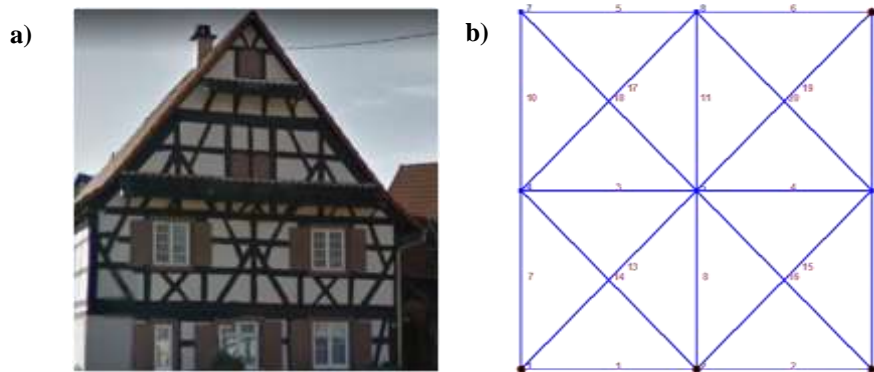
a) Example of a timber framed masonry building (TFM) b) TFM wall model with panels incorporating X-type diagonal braces.
